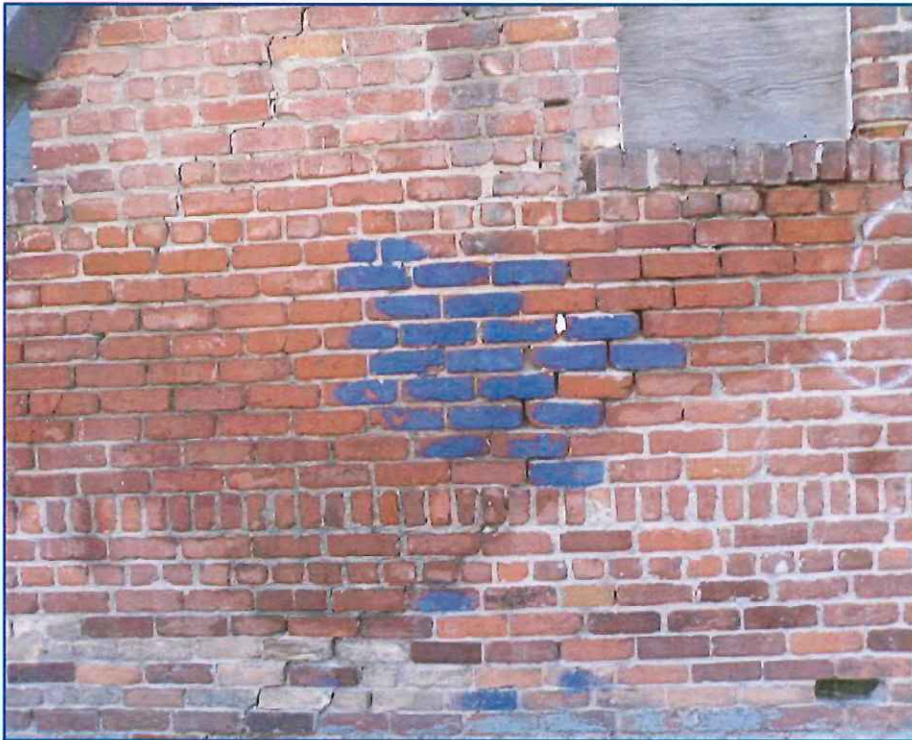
Diagonal Cracking at North Wall Masonry
